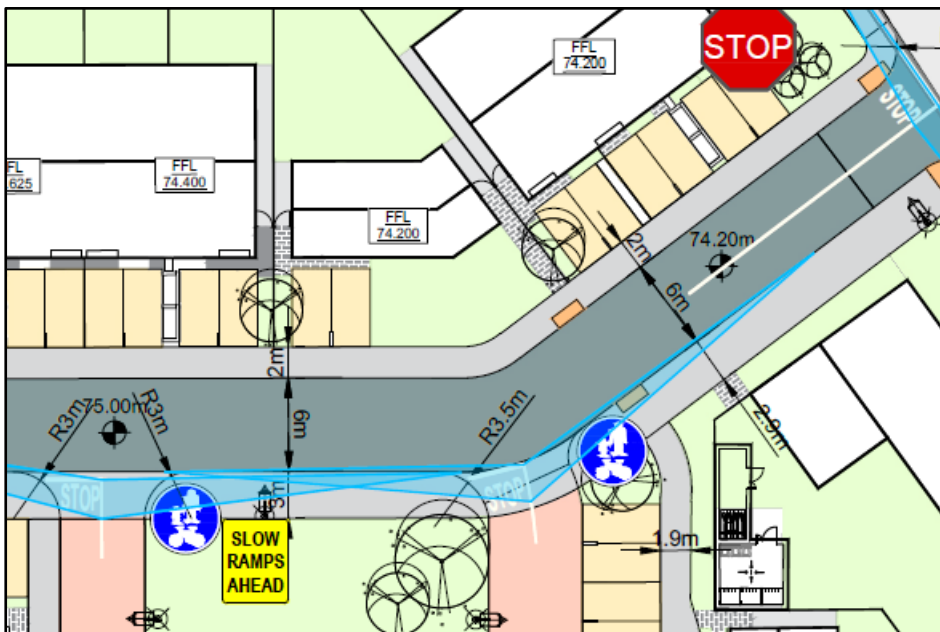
6m internal road width on main arterial estate road through The Development (Source: ORS Drawing 241139-ORS-ZZ-00-DR-TR-700)
